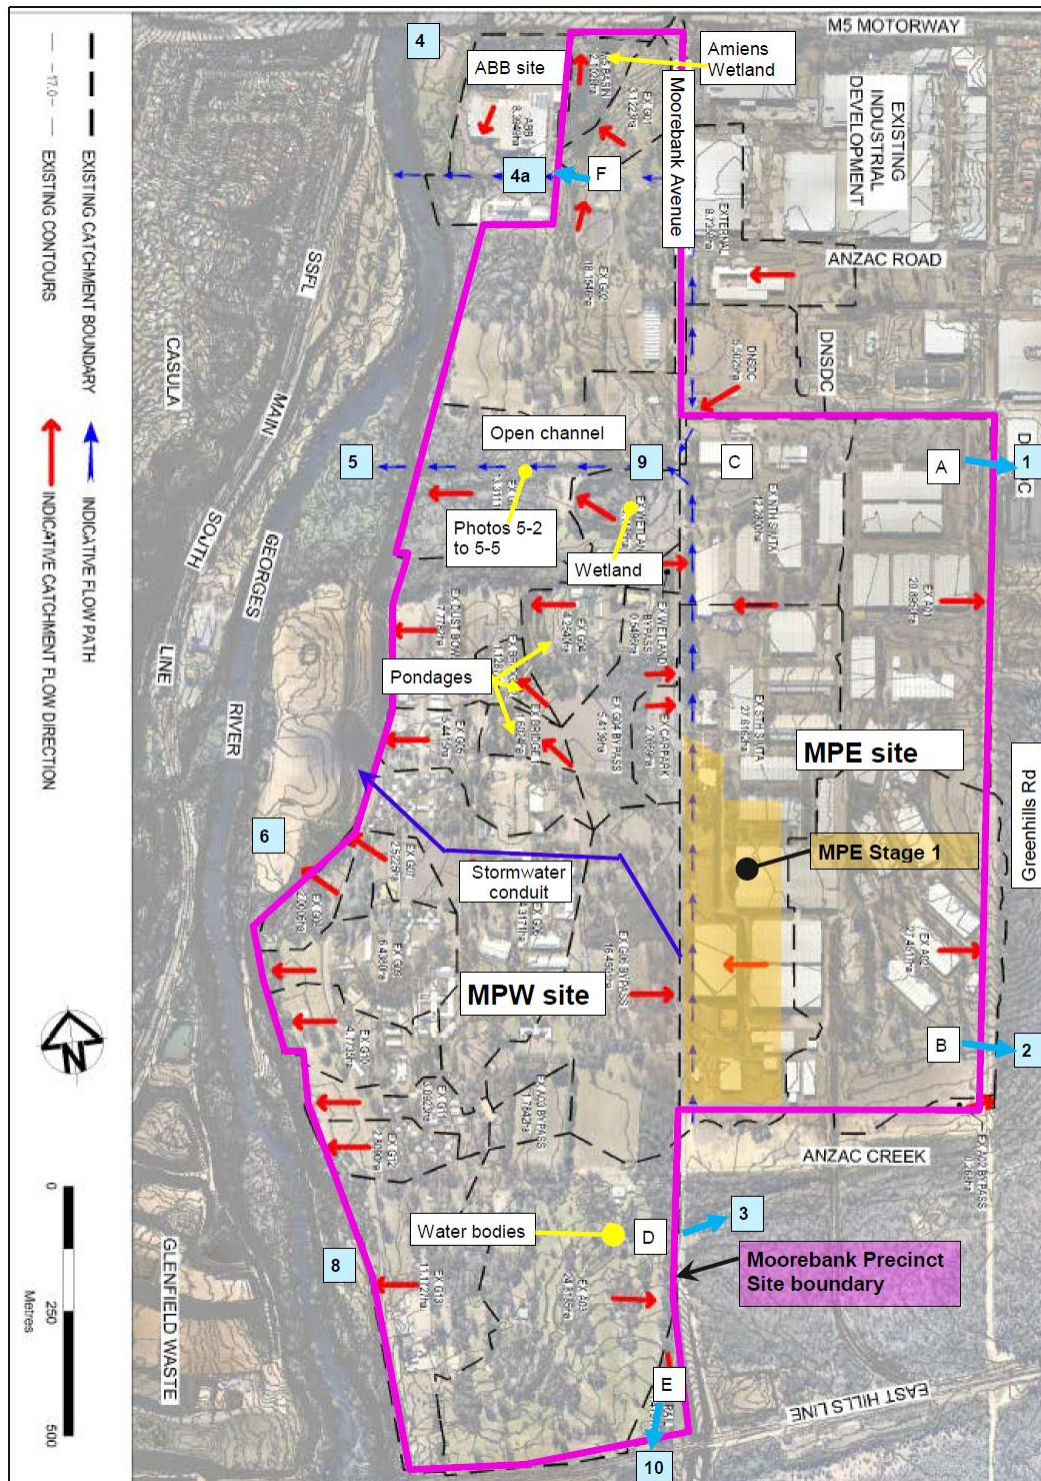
Existing Site Conditions (refer also to Appendix B Existing Conditions catchment plan)
